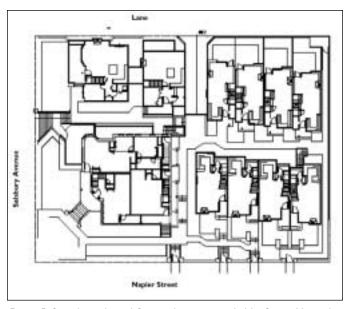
Site plan, adapted from a drawing provided by Stuart Howard Architects, shows the original heritage house, bottom left, two single-detached houses, top left, and eight townhouses, right.
